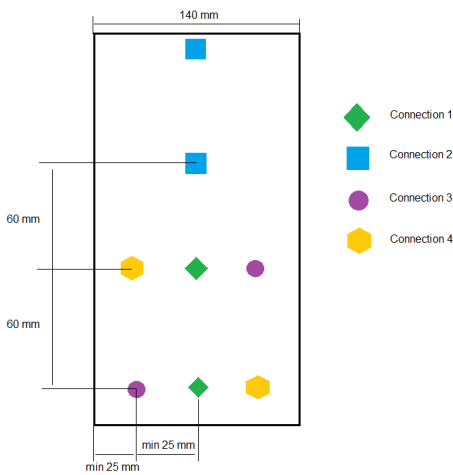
re-spacing of screwed connections in external wall panels of 38 by 140 mm² cross section, schematic
